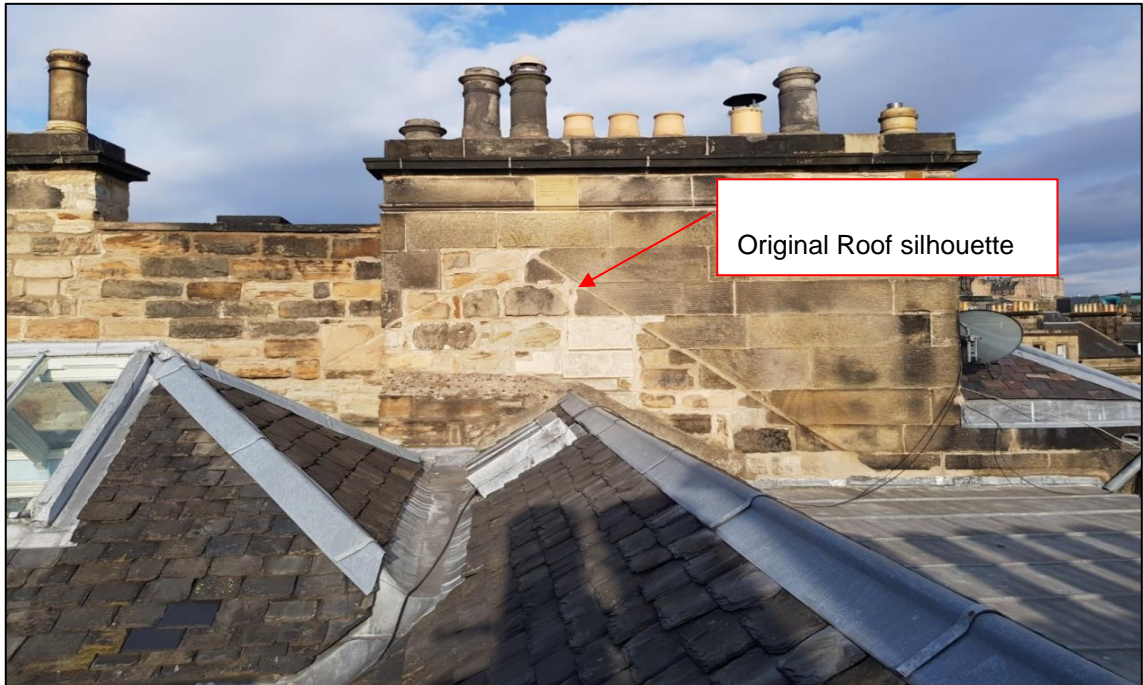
above: previous alterations to the original roof of no.10 Randolph Crescent facing front (southeast)
